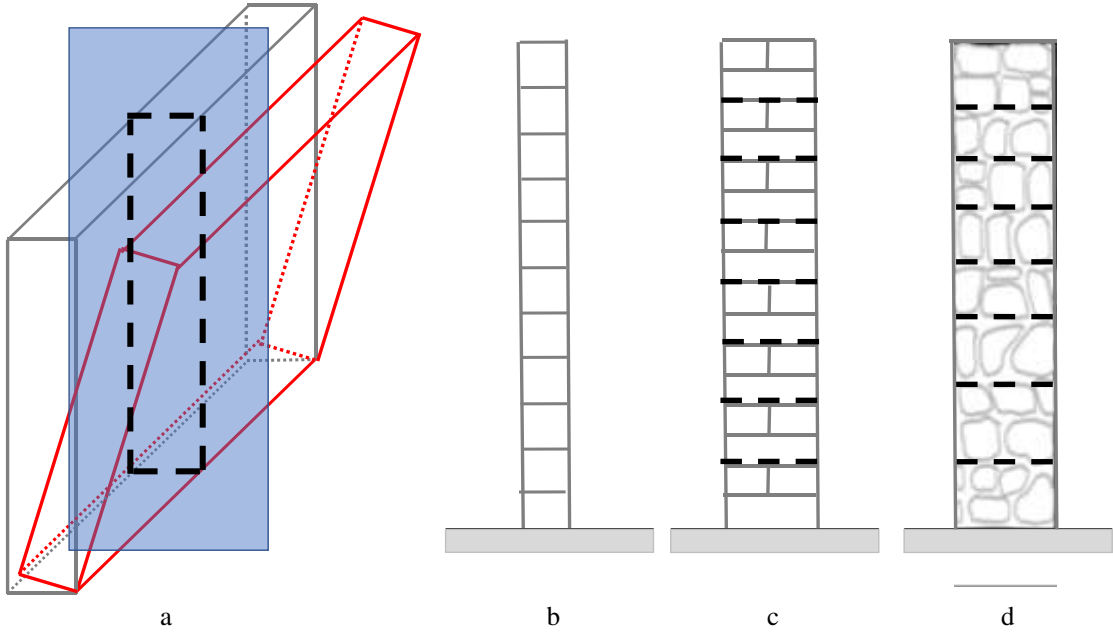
Freestanding masonry wall subjected to an overturning collapse (a); vertical sections of multi-block freestanding/cantilever walls derived from a one-headed masonry wall (a), a two-headed masonry wall (b), and from a wall made of irregular stones (c).
